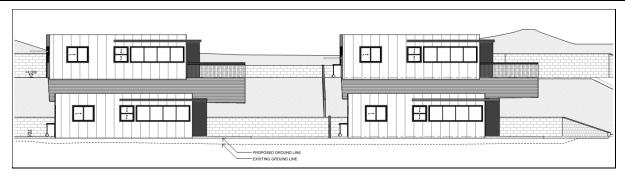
Eastern elevation (the units in the background are those relevant to this proposal)
